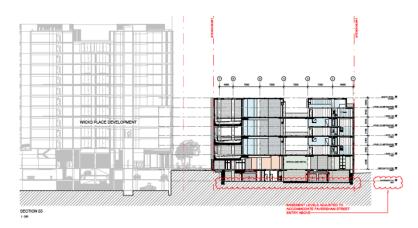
Subject site – Section – Faversham St to Wicks Place, development interface (Place Studio)
